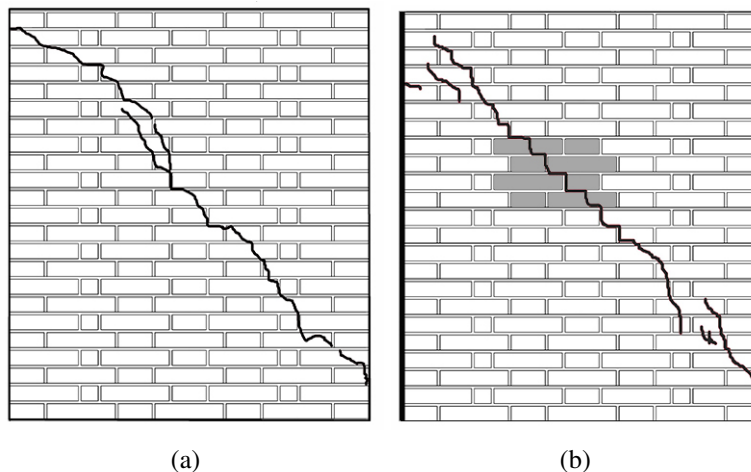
Photo of the wall at the loading step, immediately after the appearance of the diagonal crack, (a) “Undamaged” masonry wall, and (b) “Damaged” wall with the group of 12 fired bricks (6 for each side) drawn in hatched lines.
